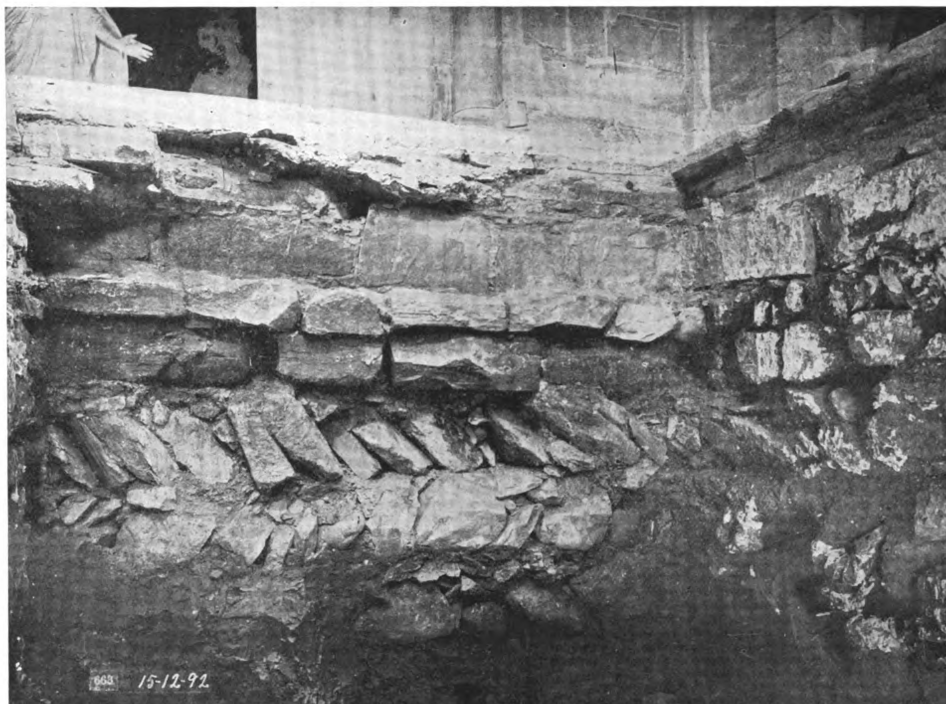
Cathedral of Nidaros. Foundation masonry under east and south walls of transept.
